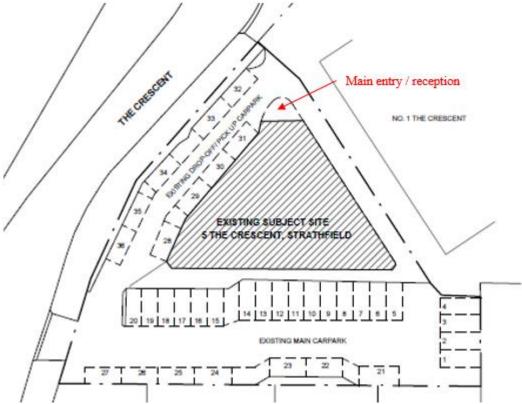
Site Plan accompanying the application showing existing car parking on the site.
